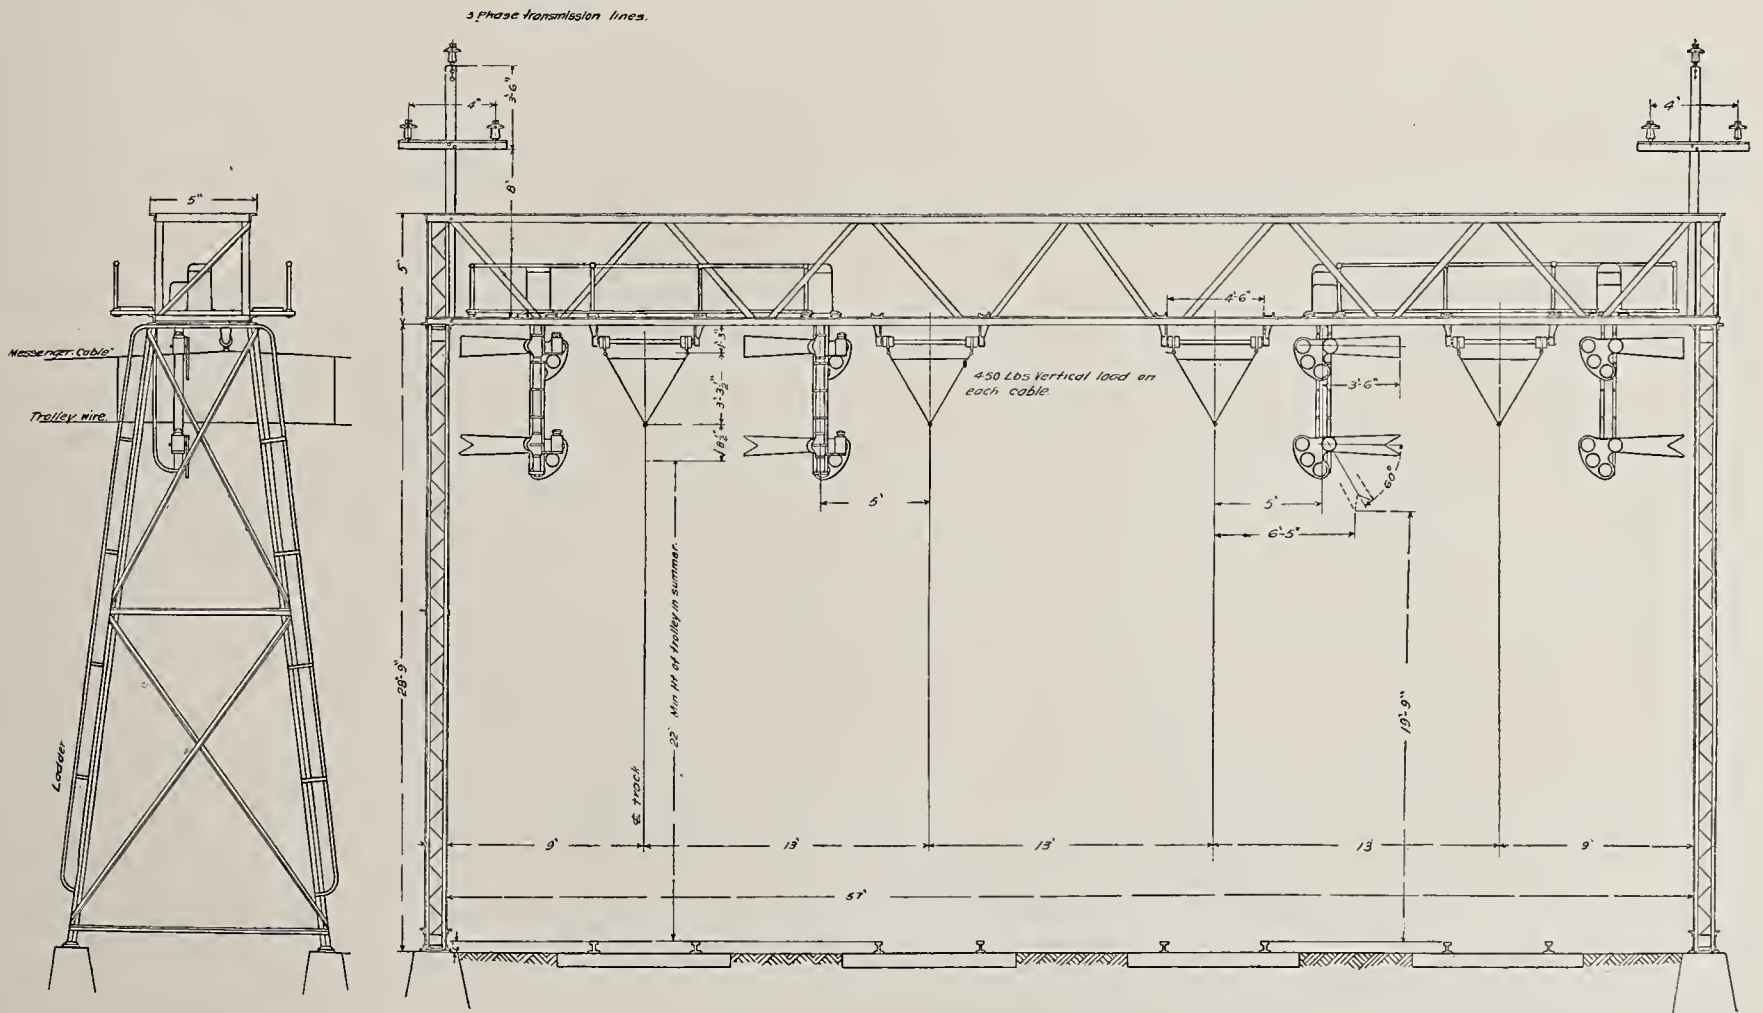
A RAILROAD SIGNAL BRIDGE CARRYING MESSENGER CABLES AND TROLLEY WIRES BESIDES THE SEMAPHORES
